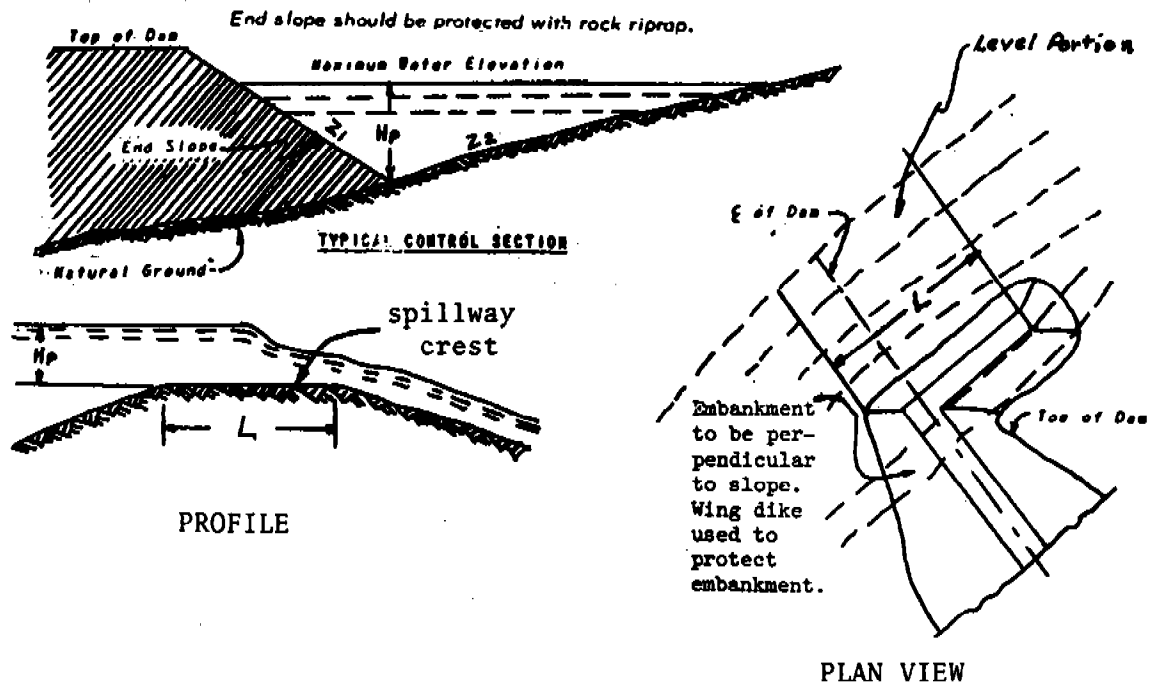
Plan, profile and cross section of a natural vegetated spillway.
